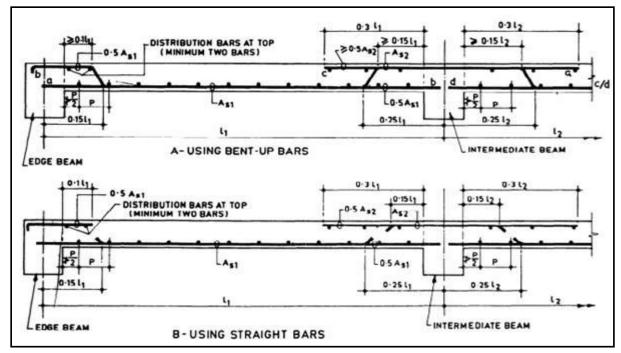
TYPICAL REINFORCEMENT FOR DECK SLAB OF BRIDGE
